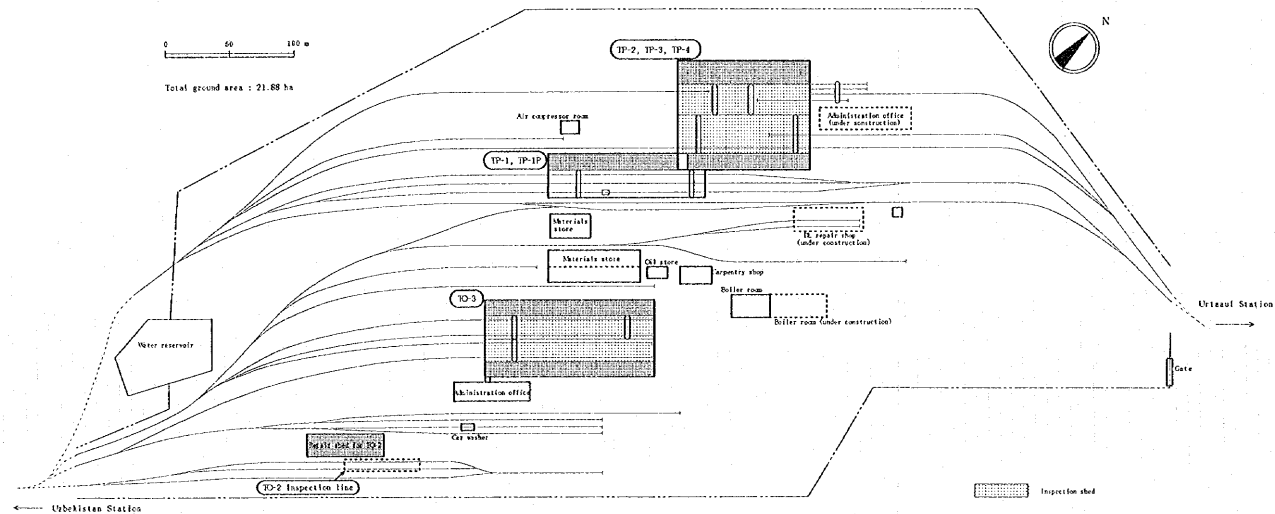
4 LAYOUT OF UZBEKISTAN DEPOT
